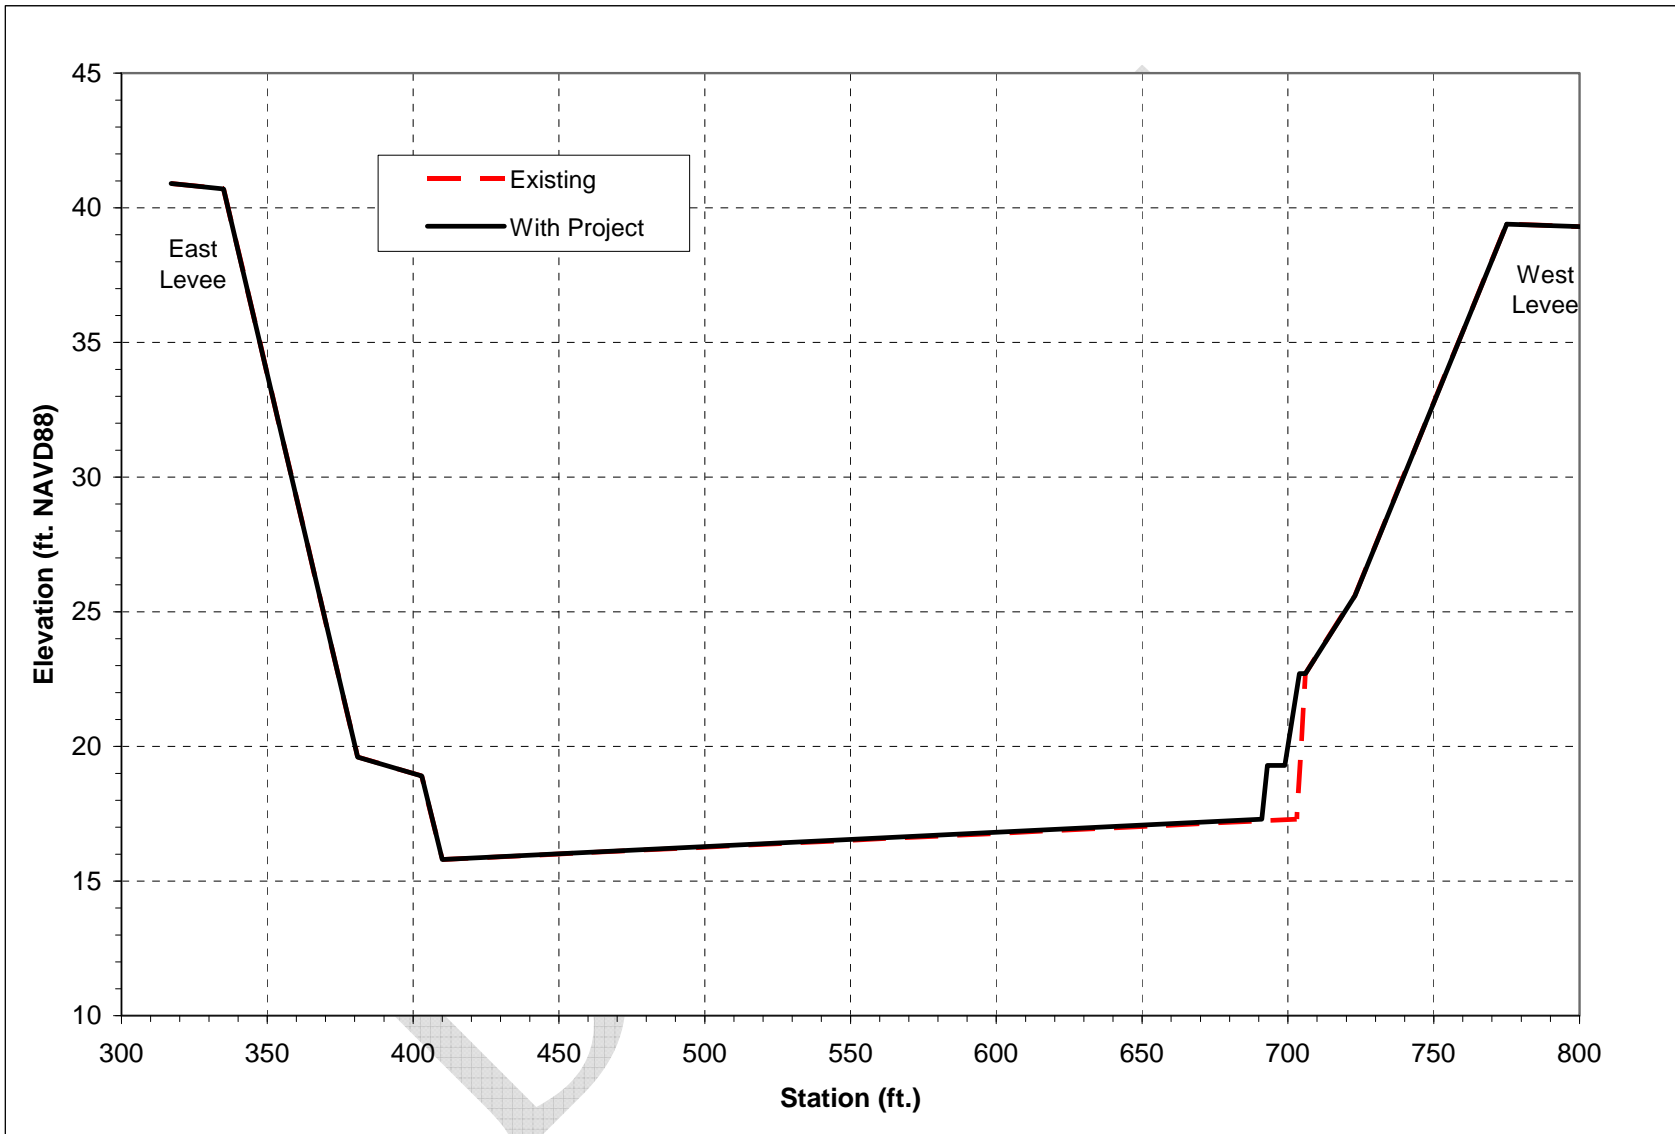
Rock Erosion Protection Berm in Hydraulic Model at NEMDC Southern Erosion Protection Site
